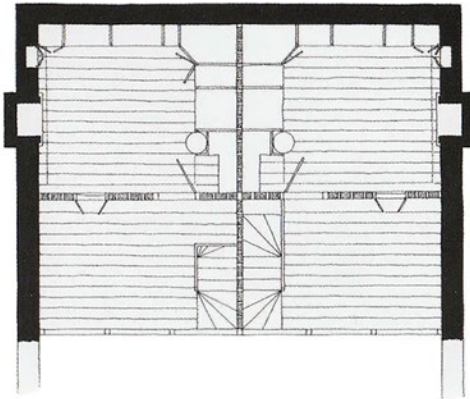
MAIN FLOOR PLAN OF THE B2 HOUSE.
